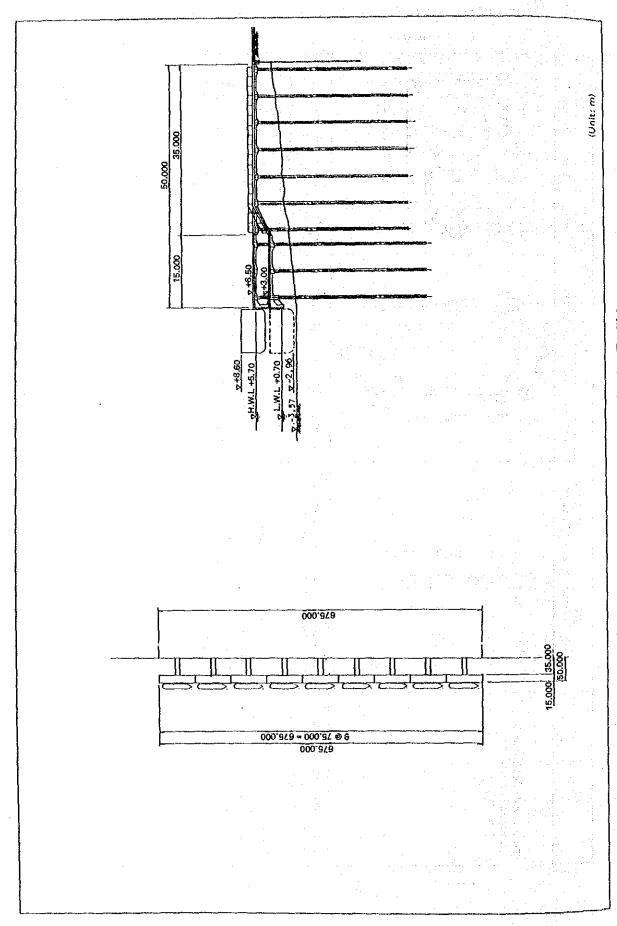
Off River Bank Type Mooring Facilities
